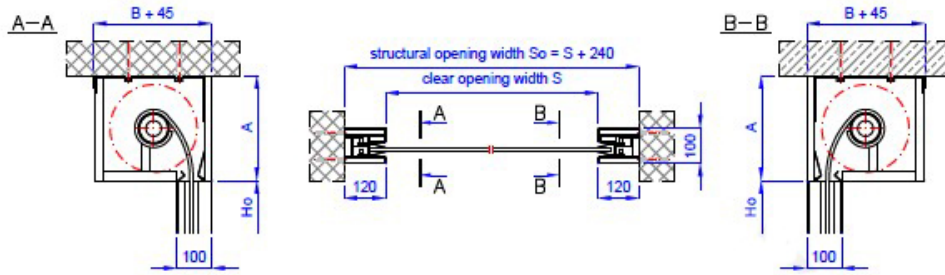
Fire protection curtain door EI120, corridor (niche) mounting
